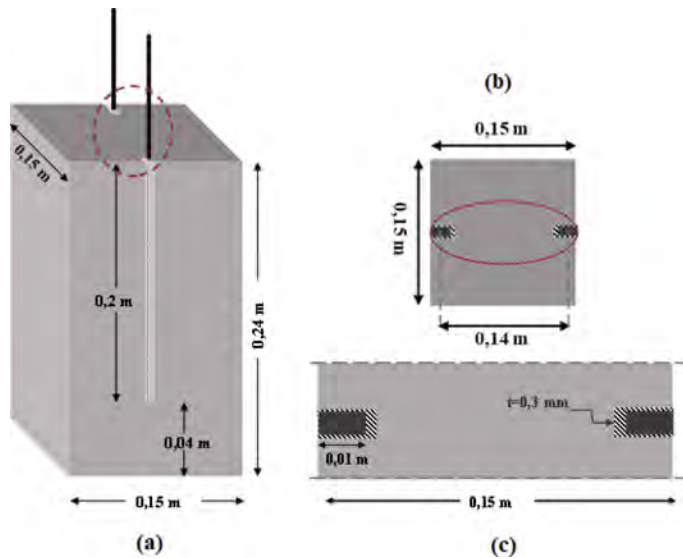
Concrete prism (a) embedment length of NSM bar, (b) detail, (c) cross-section plan view.
